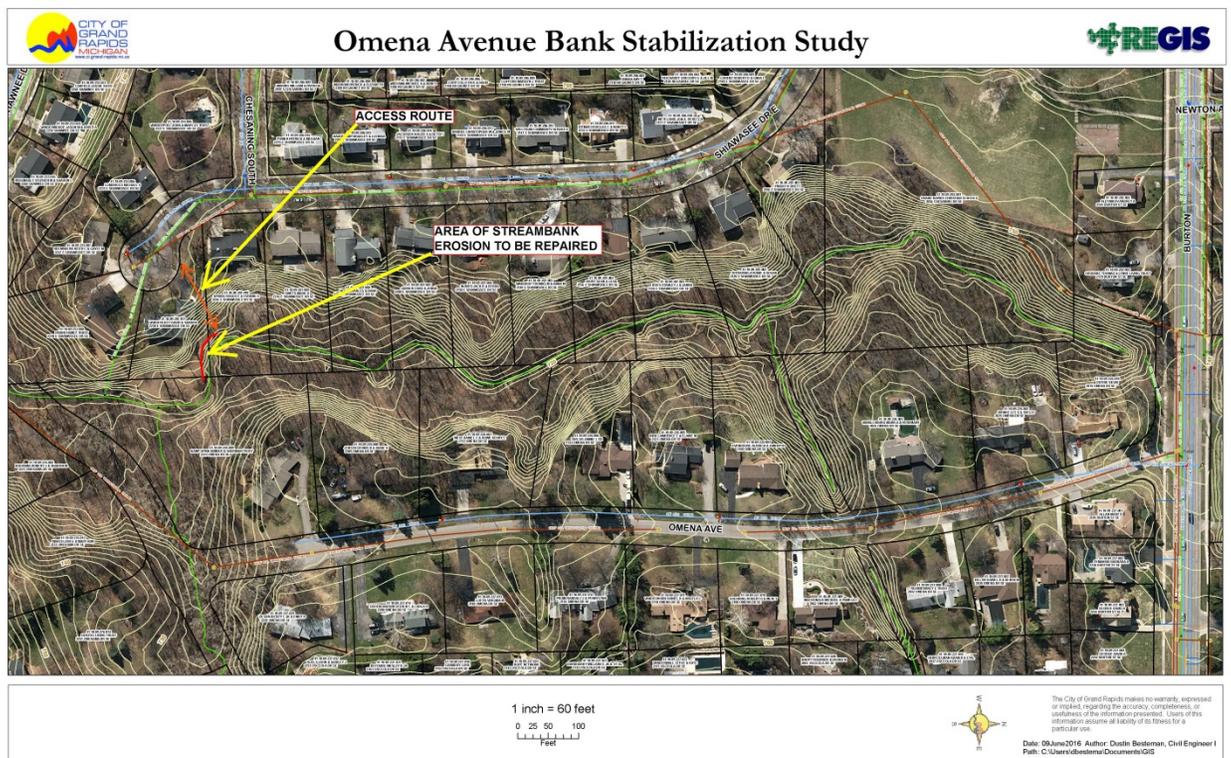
Proposed Area of Streambank Stabilization and Potential Access Route
